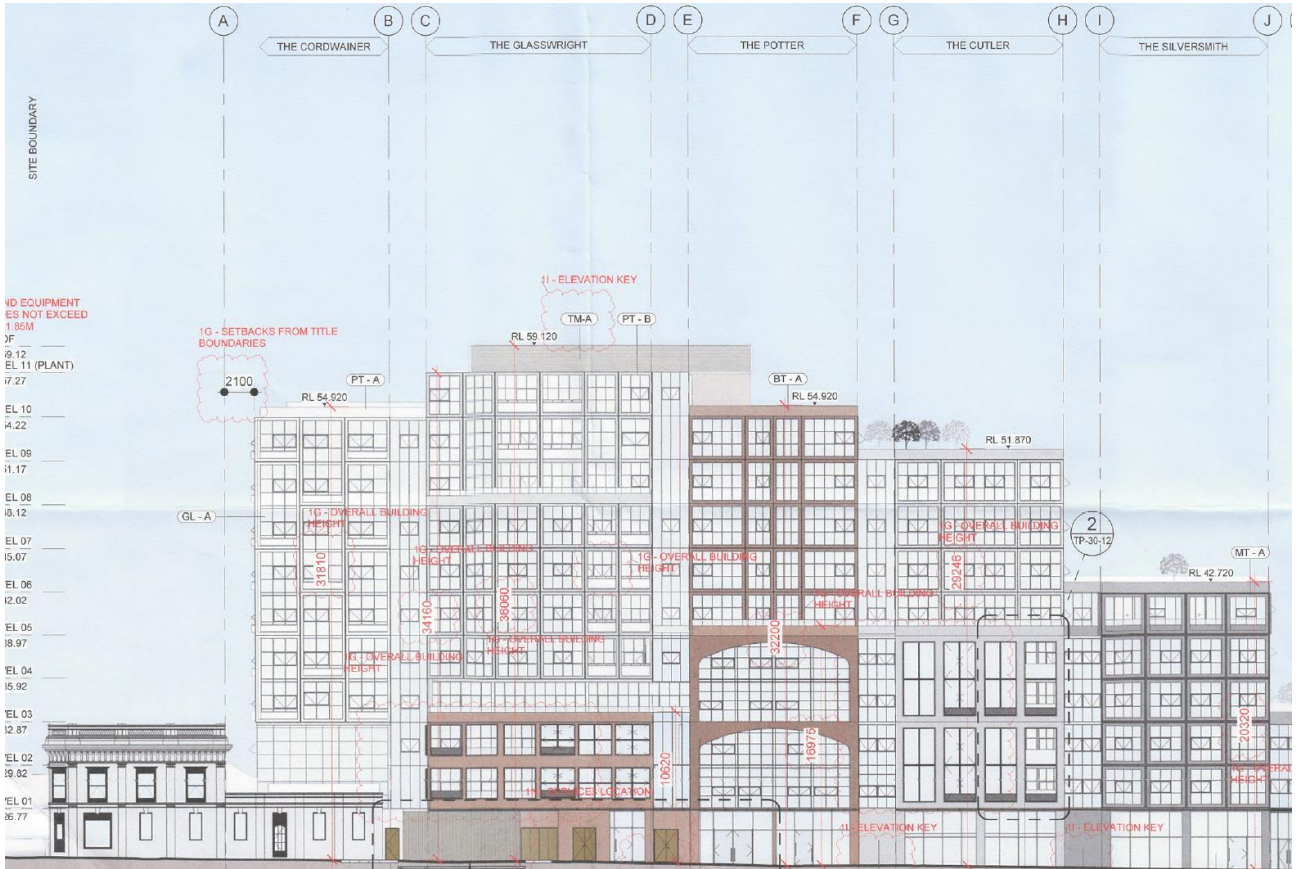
Approved Wellington St Elevation (Grid A to Grid J)
